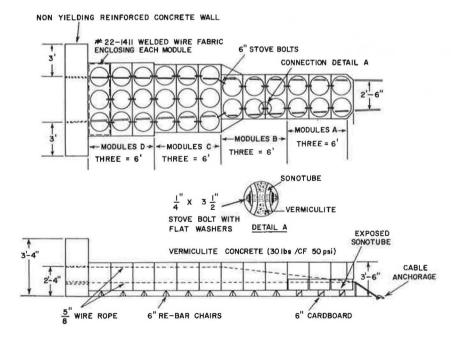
Florida Tests 1 and 2, Mod II concrete crash cushion.
